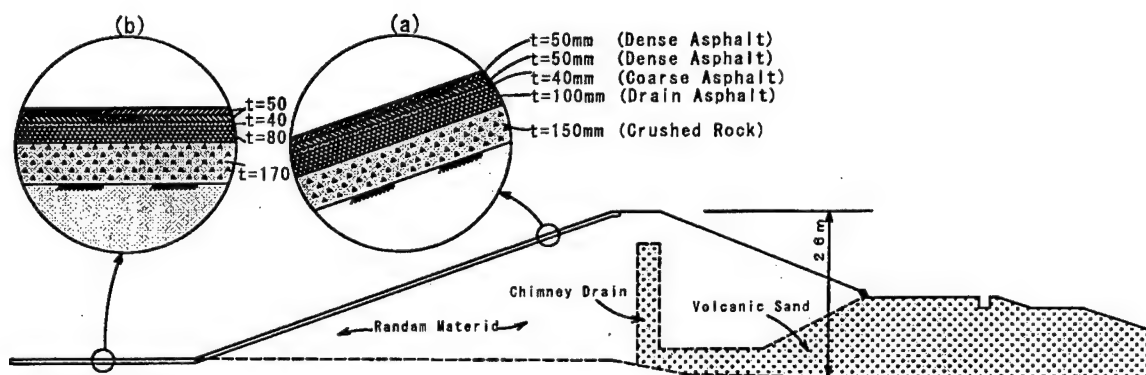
Standard Cross Section of Dam and Structure of Facing
